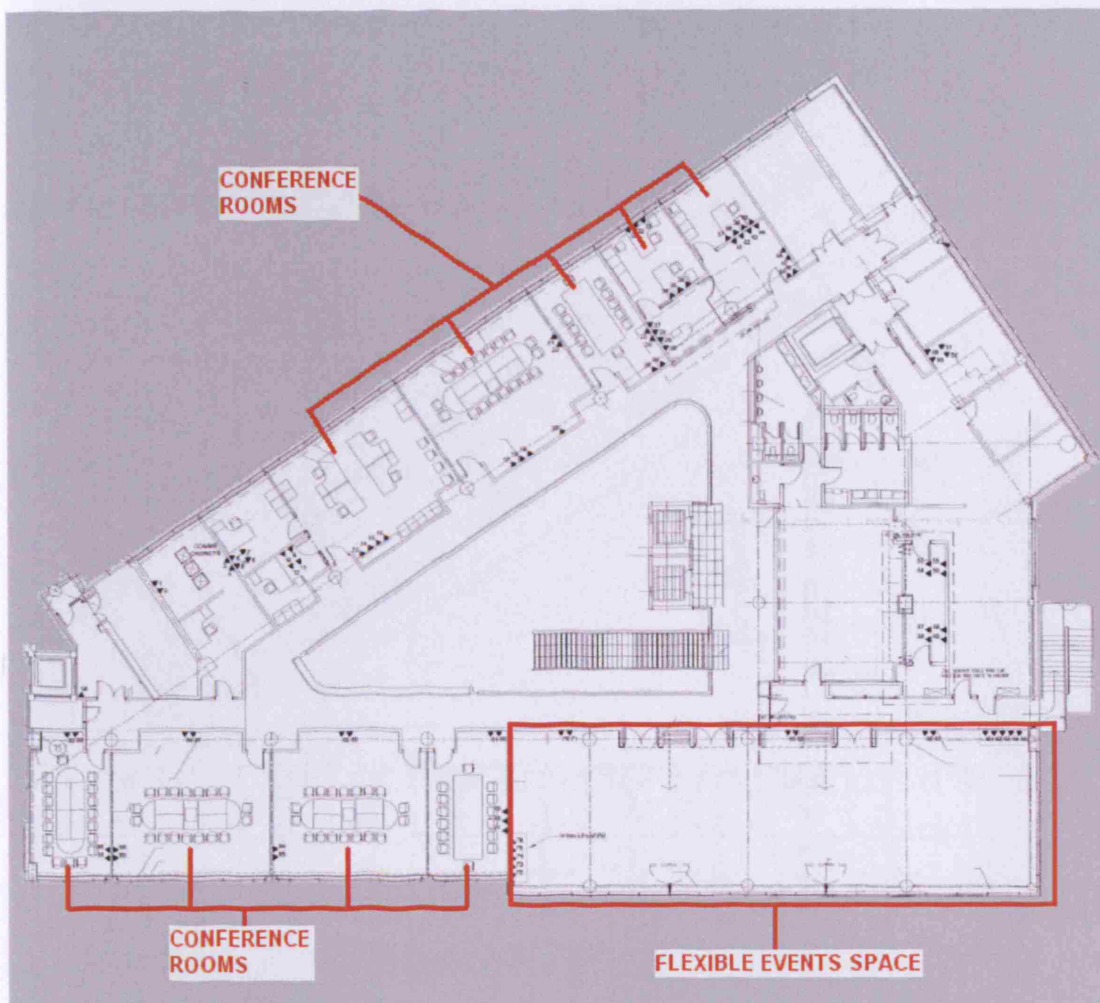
First Floor Layout, Radisson SAS Liverpool
